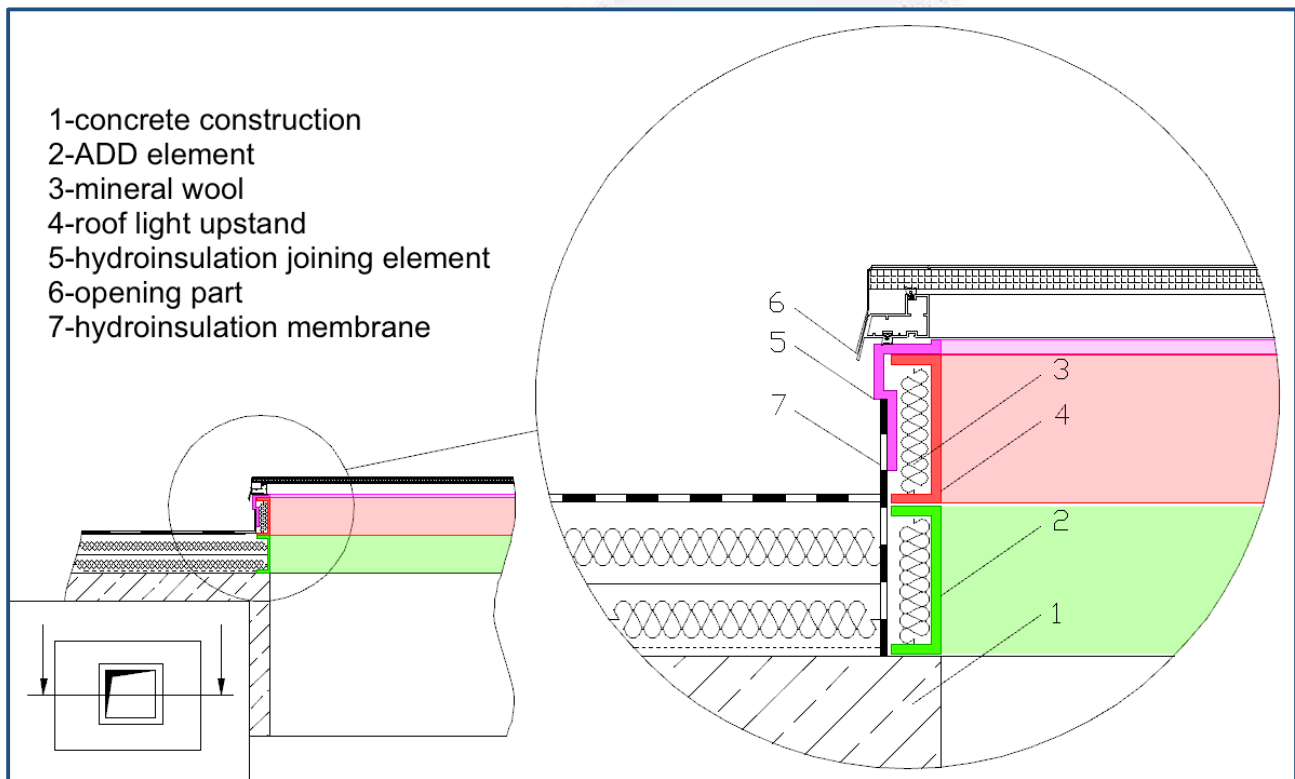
Installation scheme №2 - reinforced concrete roof / base
